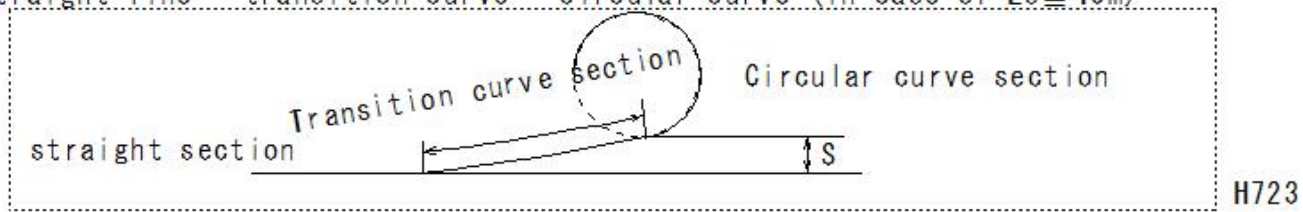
(a) Example of One-way grade(superelevation) installation
